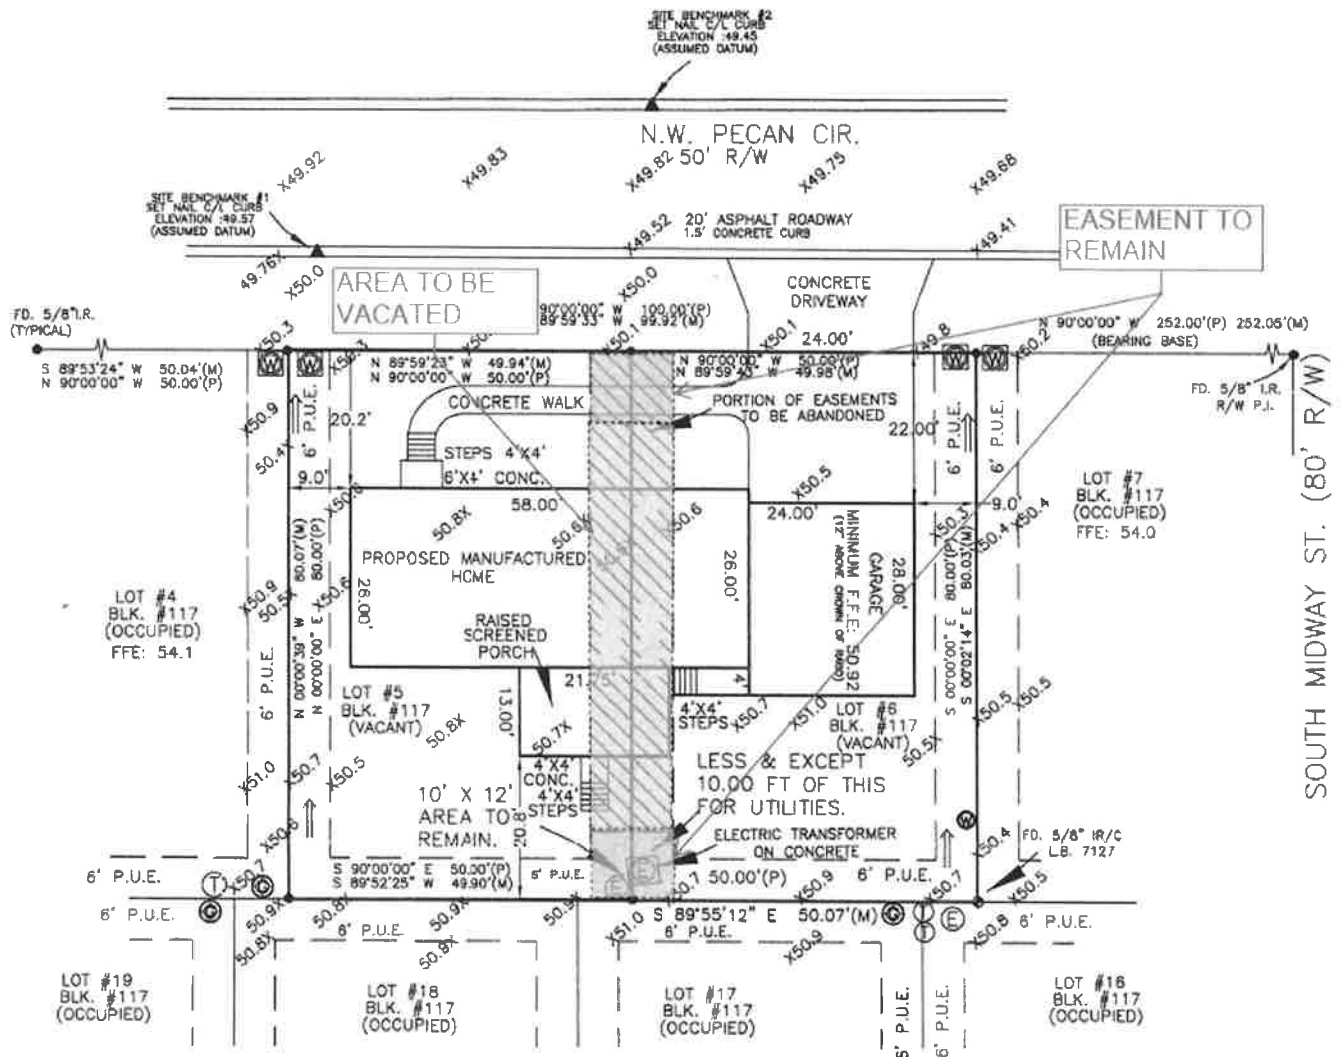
Petitioner's Proposed Plot Plan for new home on lots 5 & 6, Block 117, Barefoot Bay.
